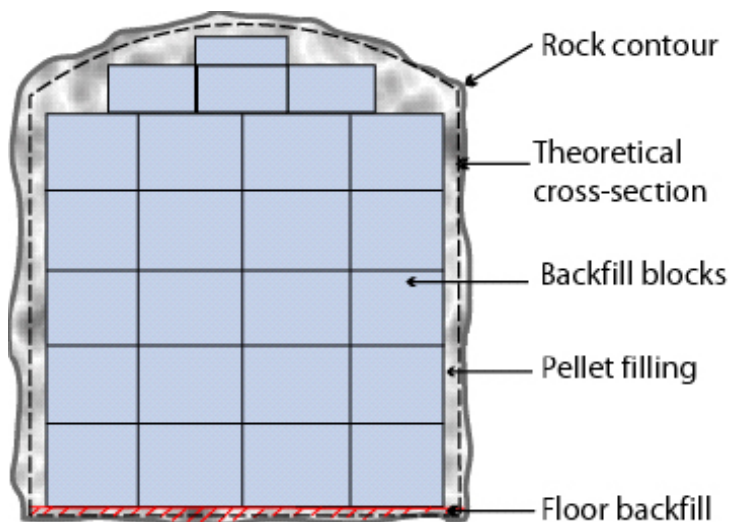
Schematic cross section of a backfilled tunnel. The three main components of the block backfill are 1) pre-compacted backfill blocks, 2) pellet filling and 3) material placed underneath the blocks to provide stable foundation for the block assemblage.
